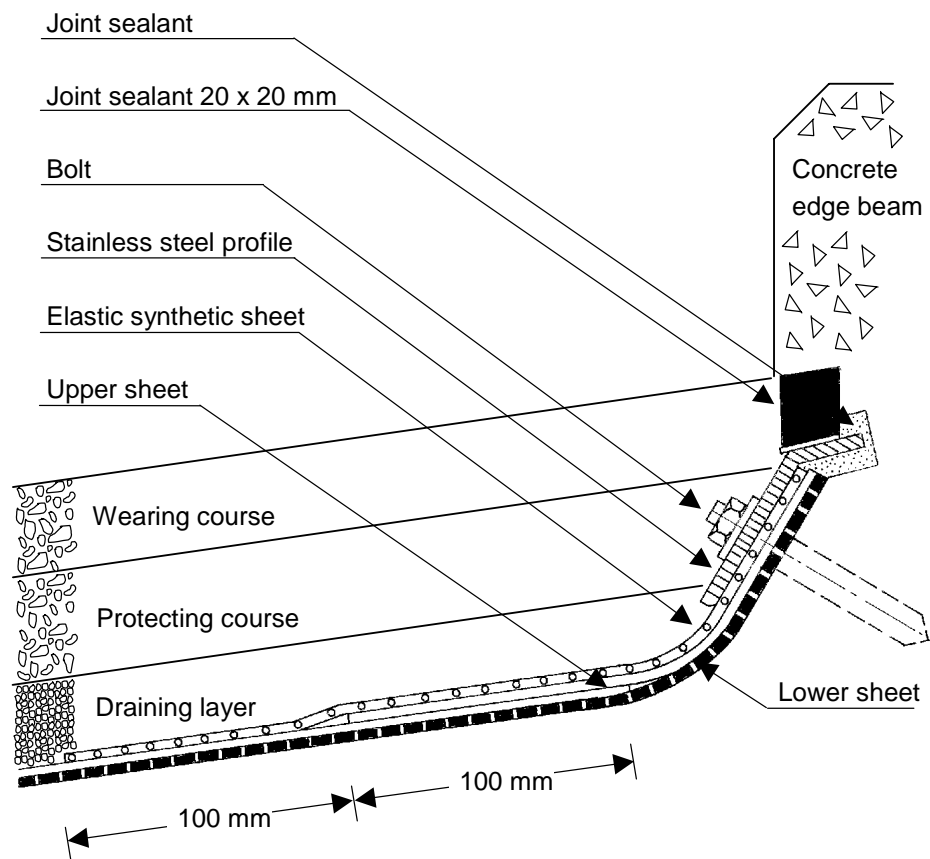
Special care is taken at the edge beam where the sheets are fastened with a stainless steel profile to the concrete.
